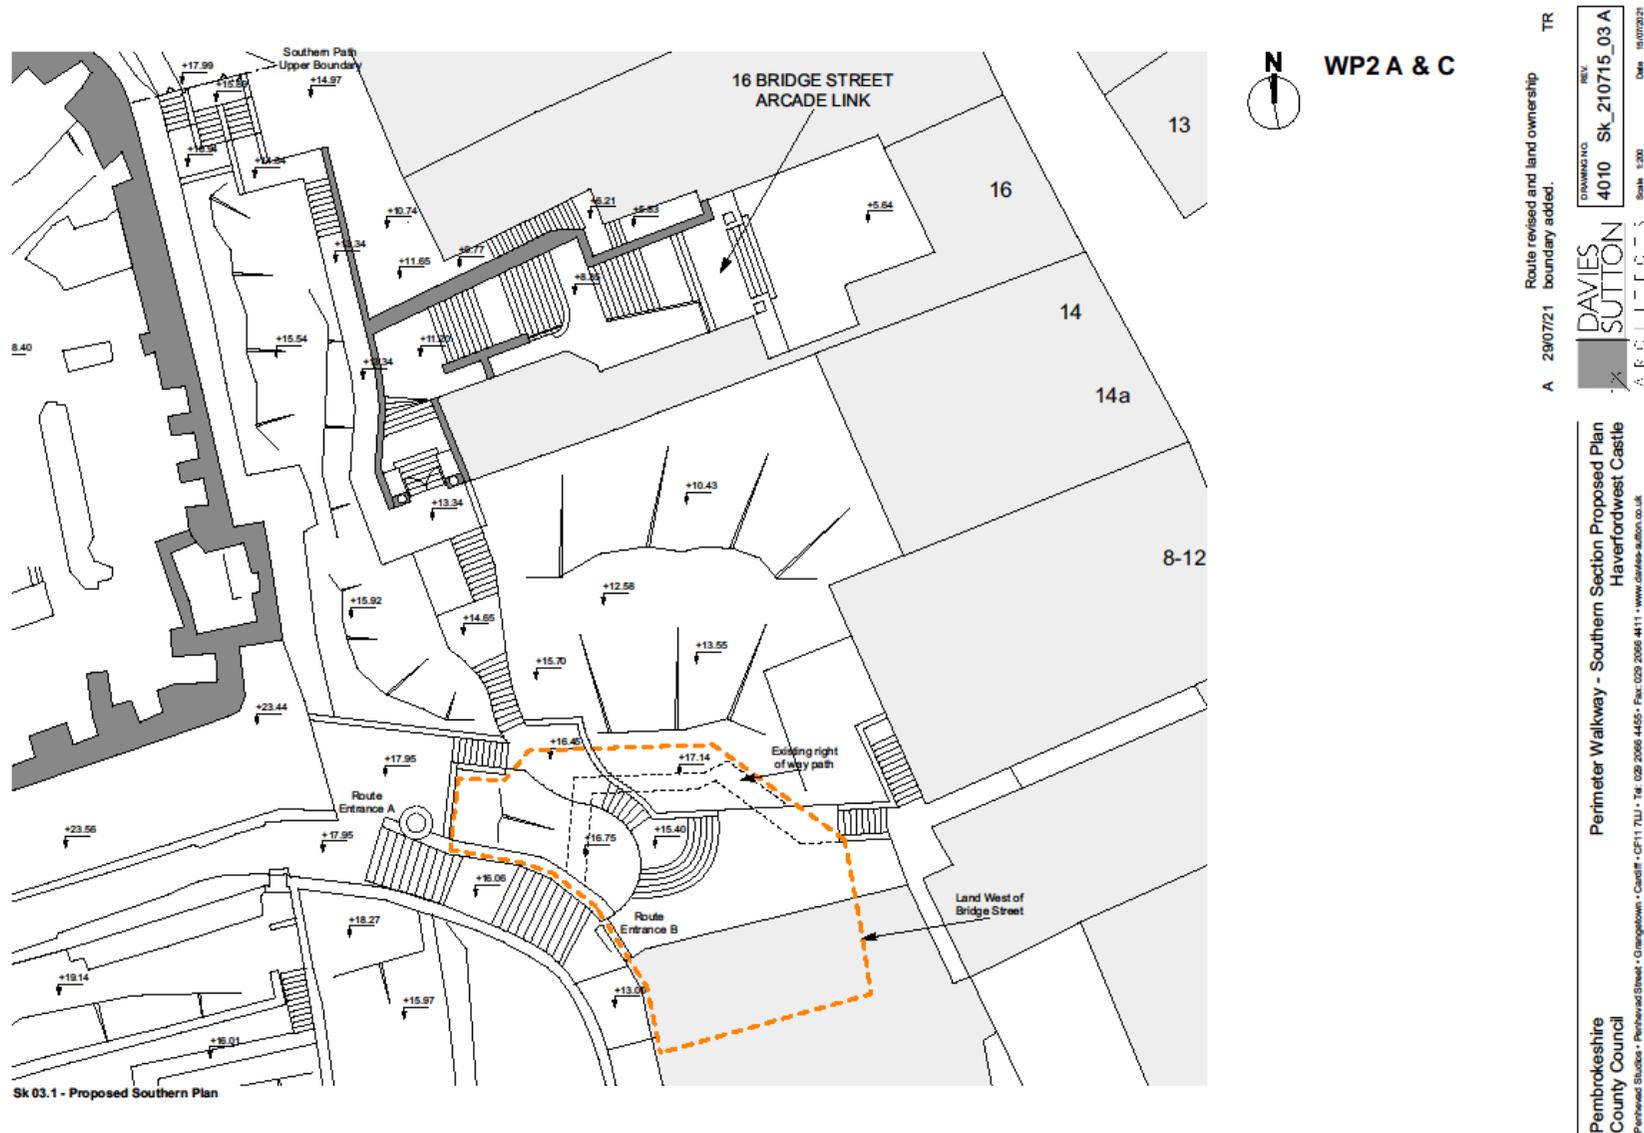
Plan showing the proposed southern section of the step arrangement leading to the perimeter walkway.
